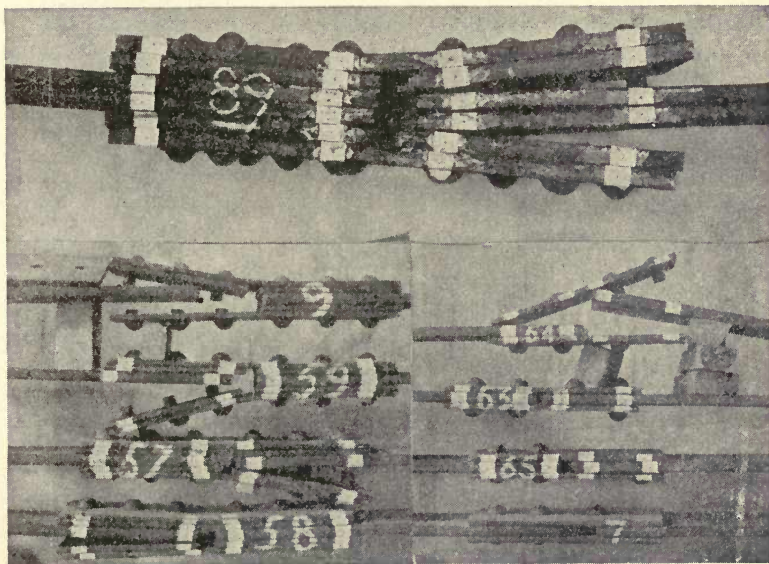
VIEW OF FRACTURED TEST PIECES SHOWING MOVEMENT OF PLATES.
